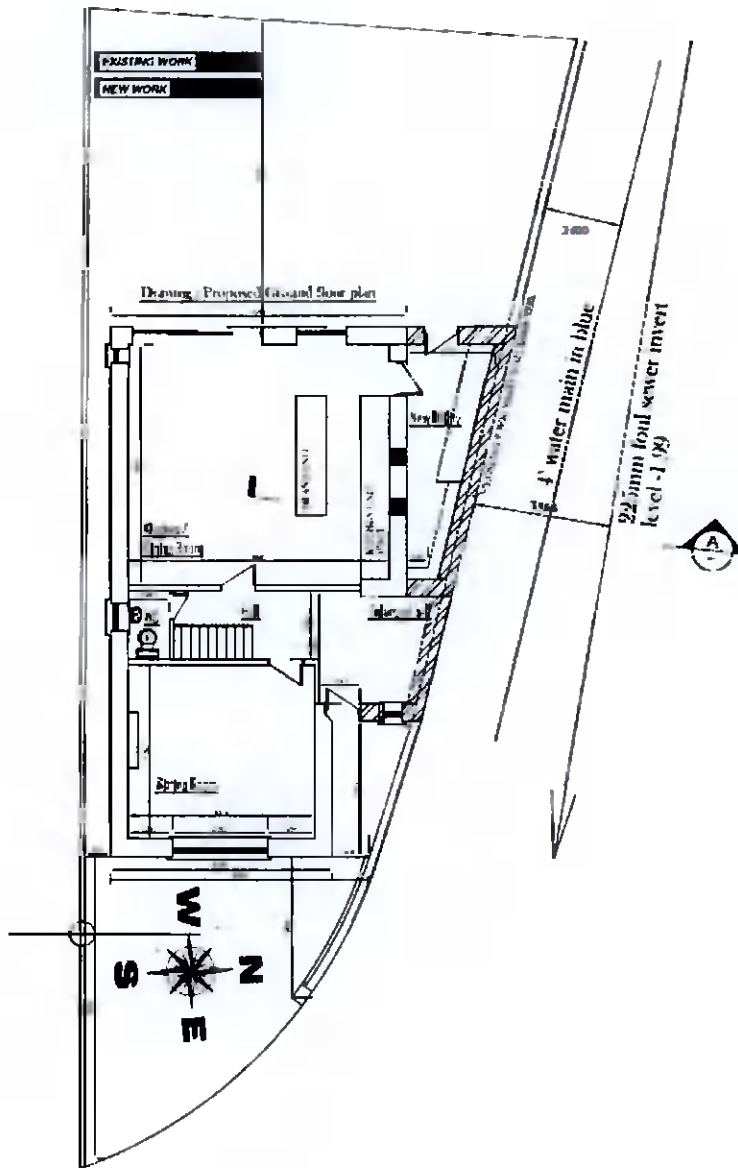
Proposed plan showing existing watermain and foul sewer beyond boundary line
